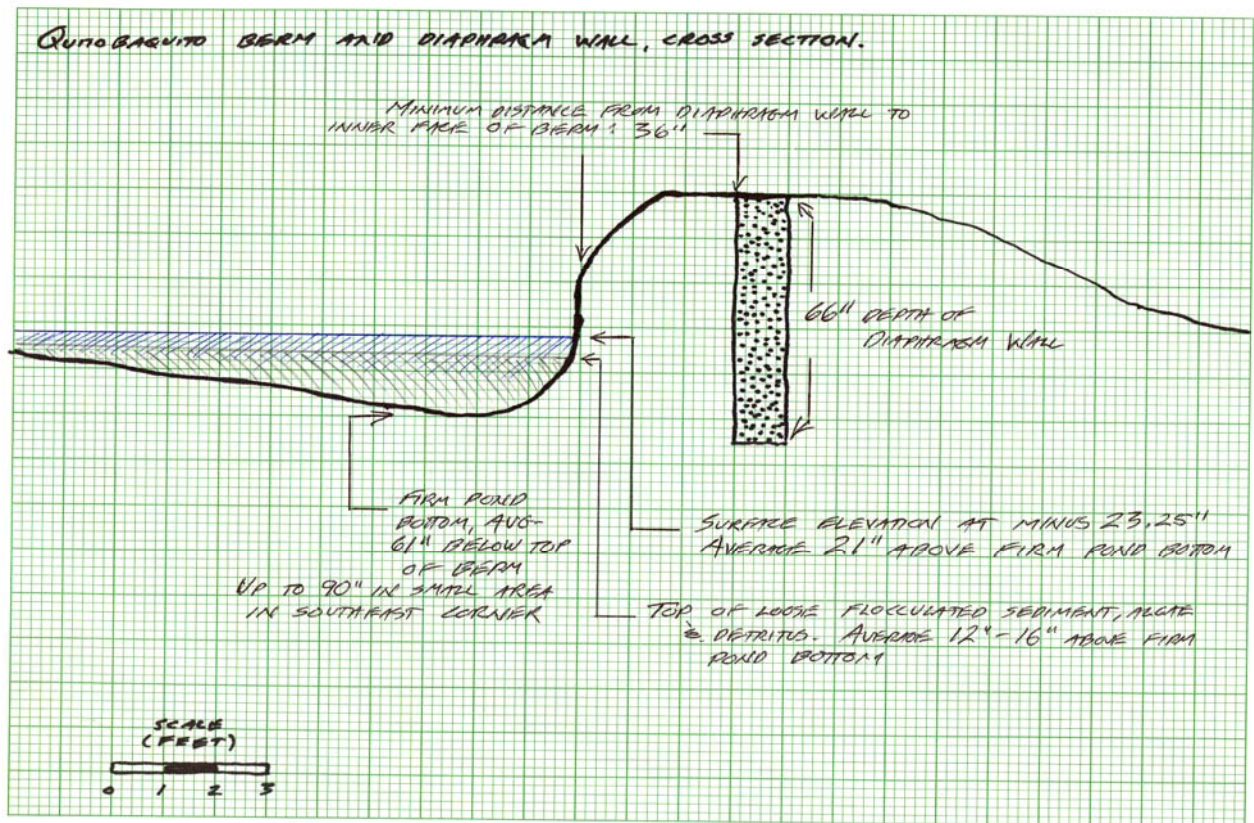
Schematic cross-section of retaining berm at Quitobaquito Pond, including diaphragm wall. Diagram illustrates water level of 23.25” below outflow pipe. The diaphragm wall as built is 66” to 72” deep. Organ Pipe Cactus National Monument, Arizona.
